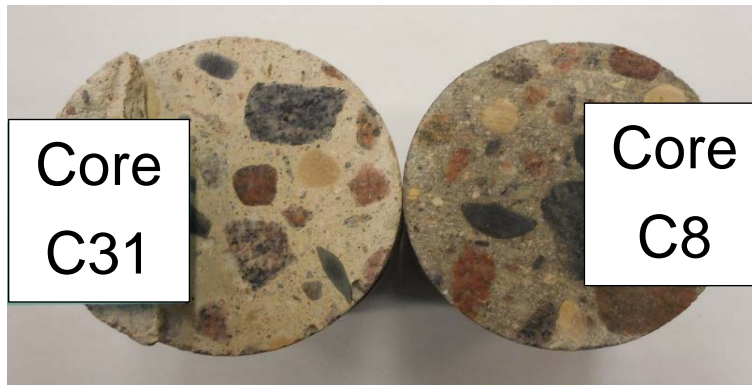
Sections of Cores C31 (Room 538, South Wall) and C8 (Room 203, West Wall) showing paste colour difference.
